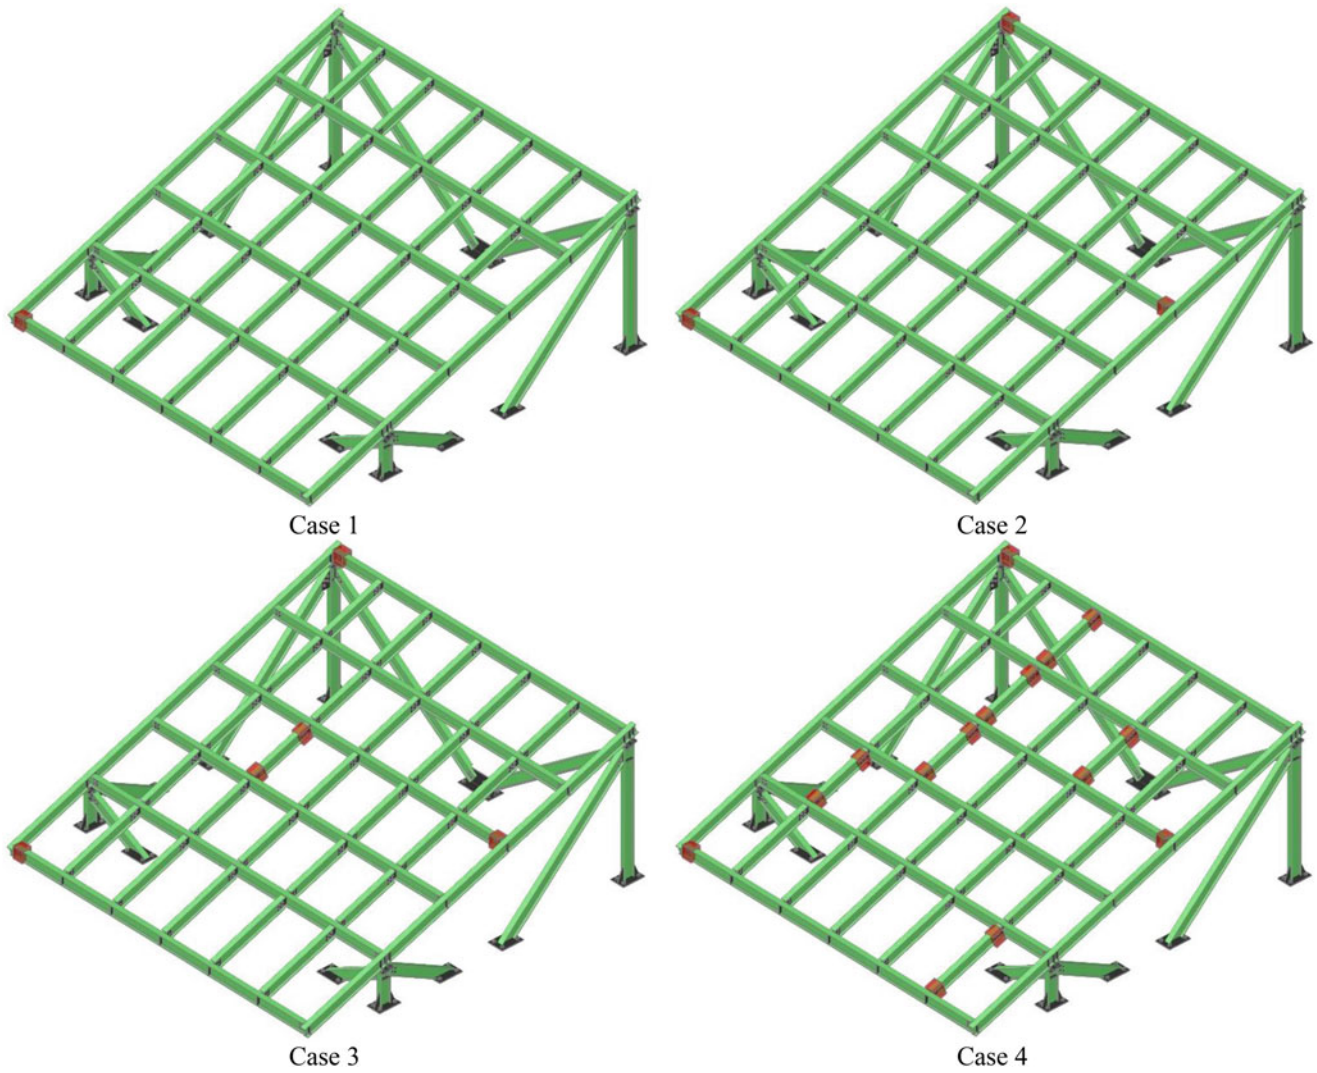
Damage cases 1–4 (*highlighted connections* represent damaged connections)
